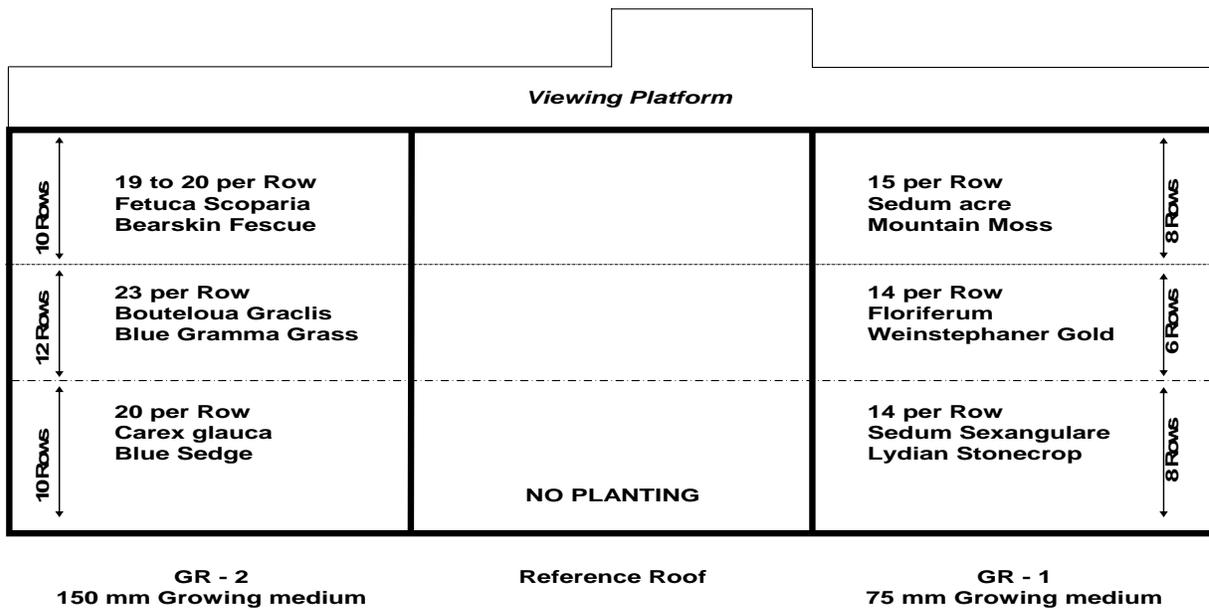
Planting plan at BCIT’s Green Roof Research Facility in 2005.
